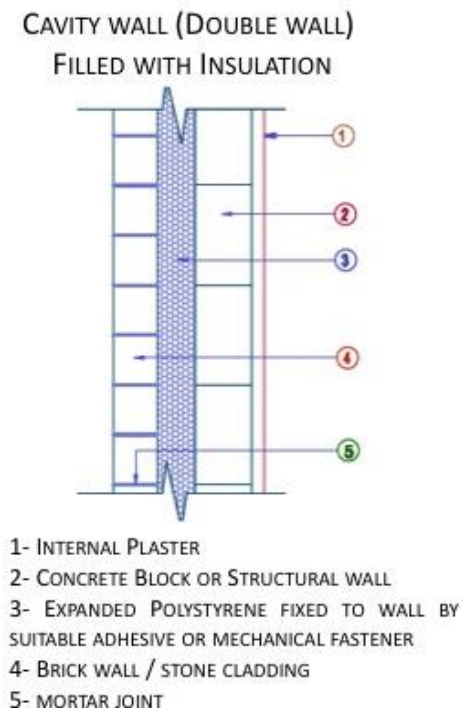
Cavity block wall filled with 50 mm polystyrene (Source: EWA, 2013).
